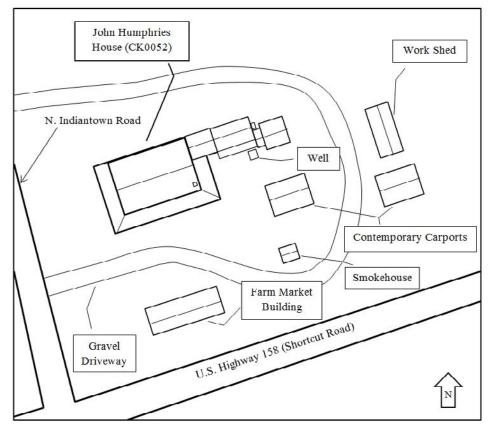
Site Plan of the John Humphries House, Not Drawn to Scale.
